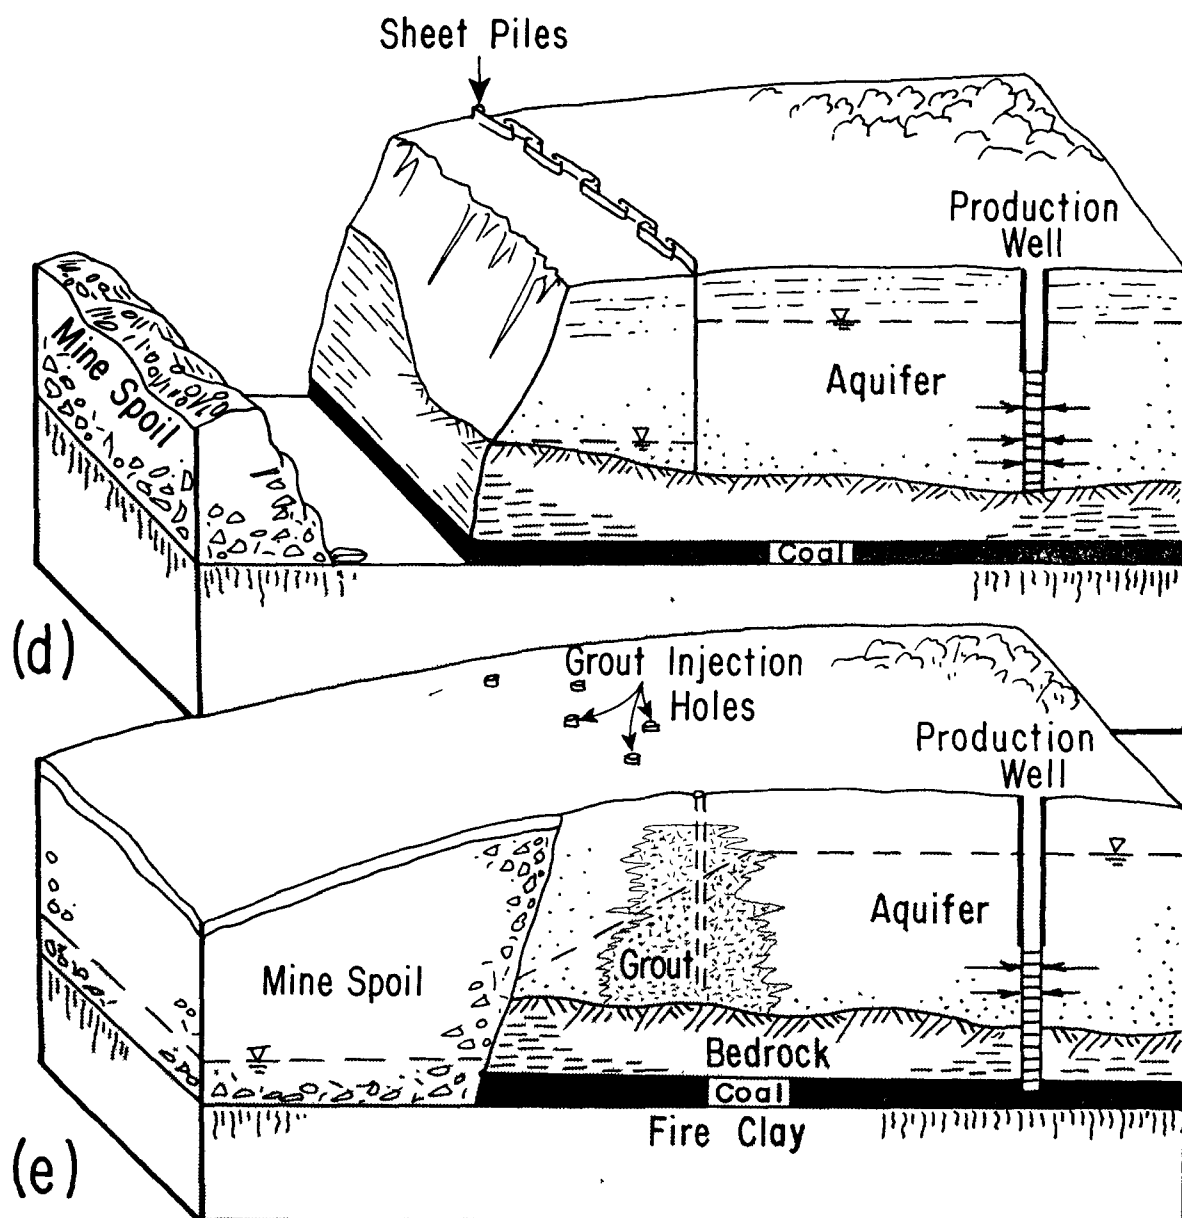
Sheet piles (d) and grout cutoff curtains (e) used in unconsolidated overburden deposits to maintain groundwater levels during and following mining. (Note that sheet piles can be recovered from this situation, where groundwater levels will recover if backfilled with less permeable spoil deposits and hydraulic closure is insured for the mine spoil and aquifer.)
